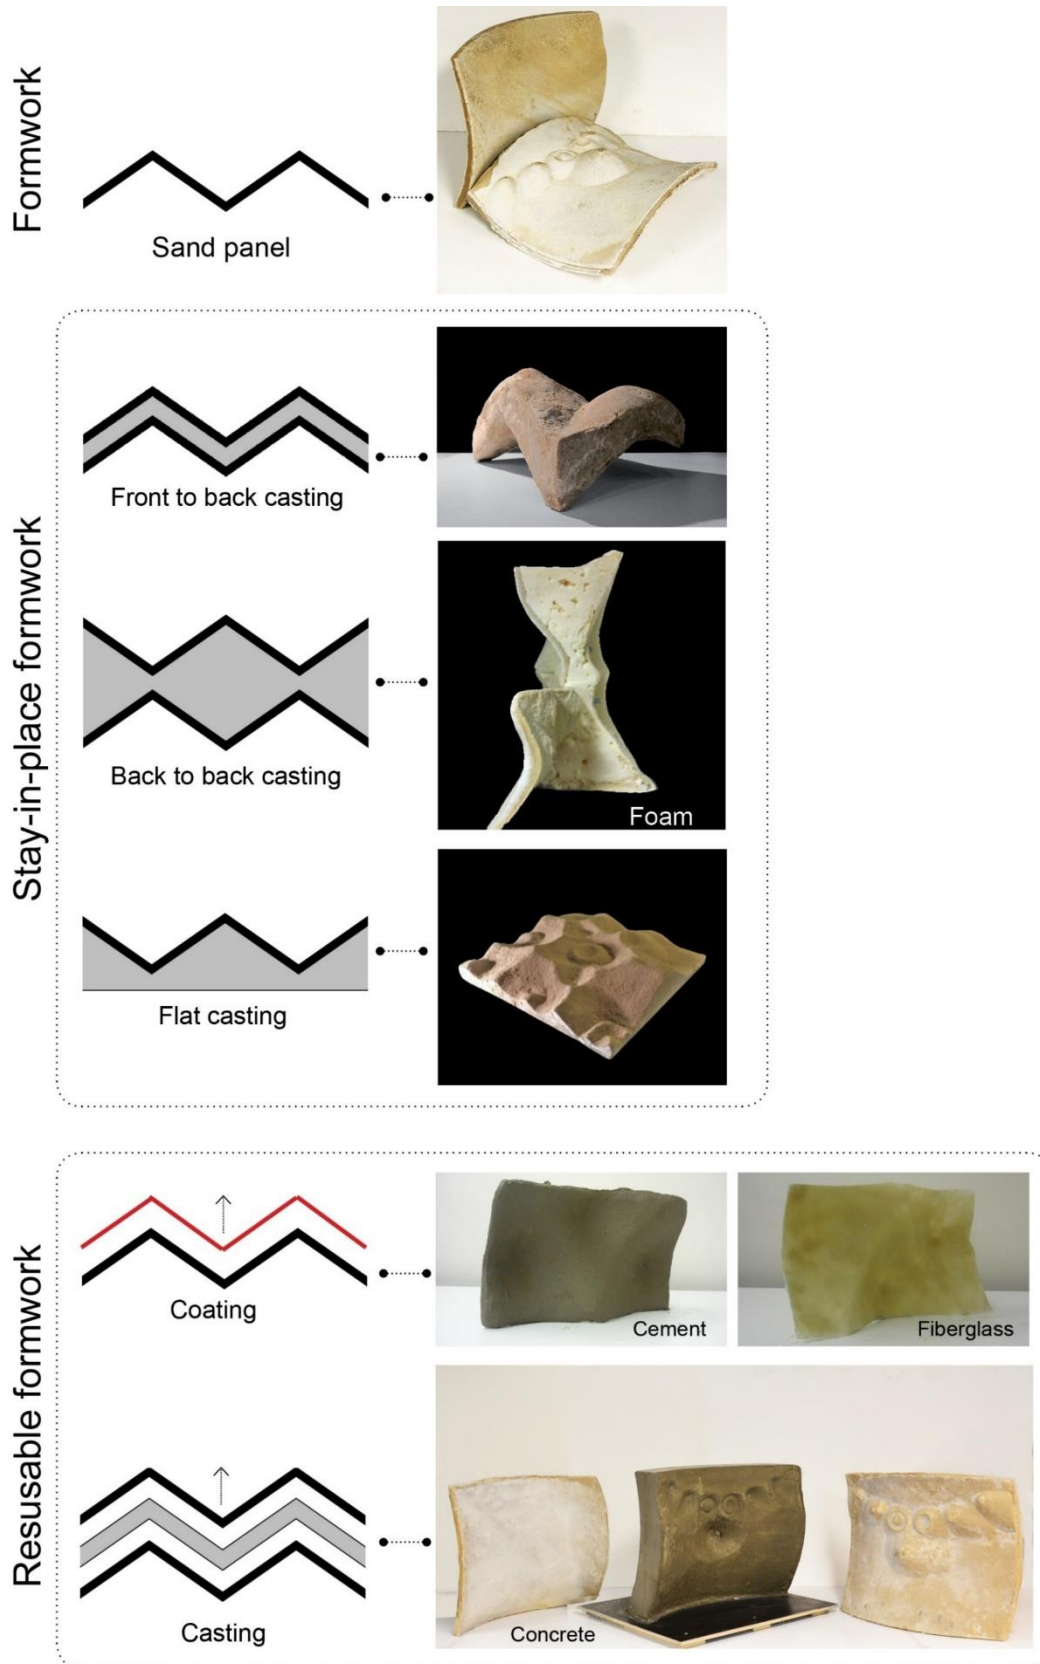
Casting techniques of sand panels either as stay-in or reusable formwork
